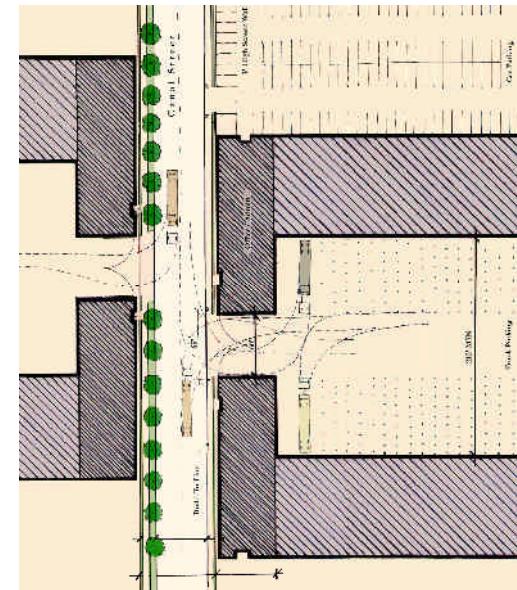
(Left) Typical light-industrial development along Canal Street; administrative spaces from Canal Street to create a unified urban street wall.
